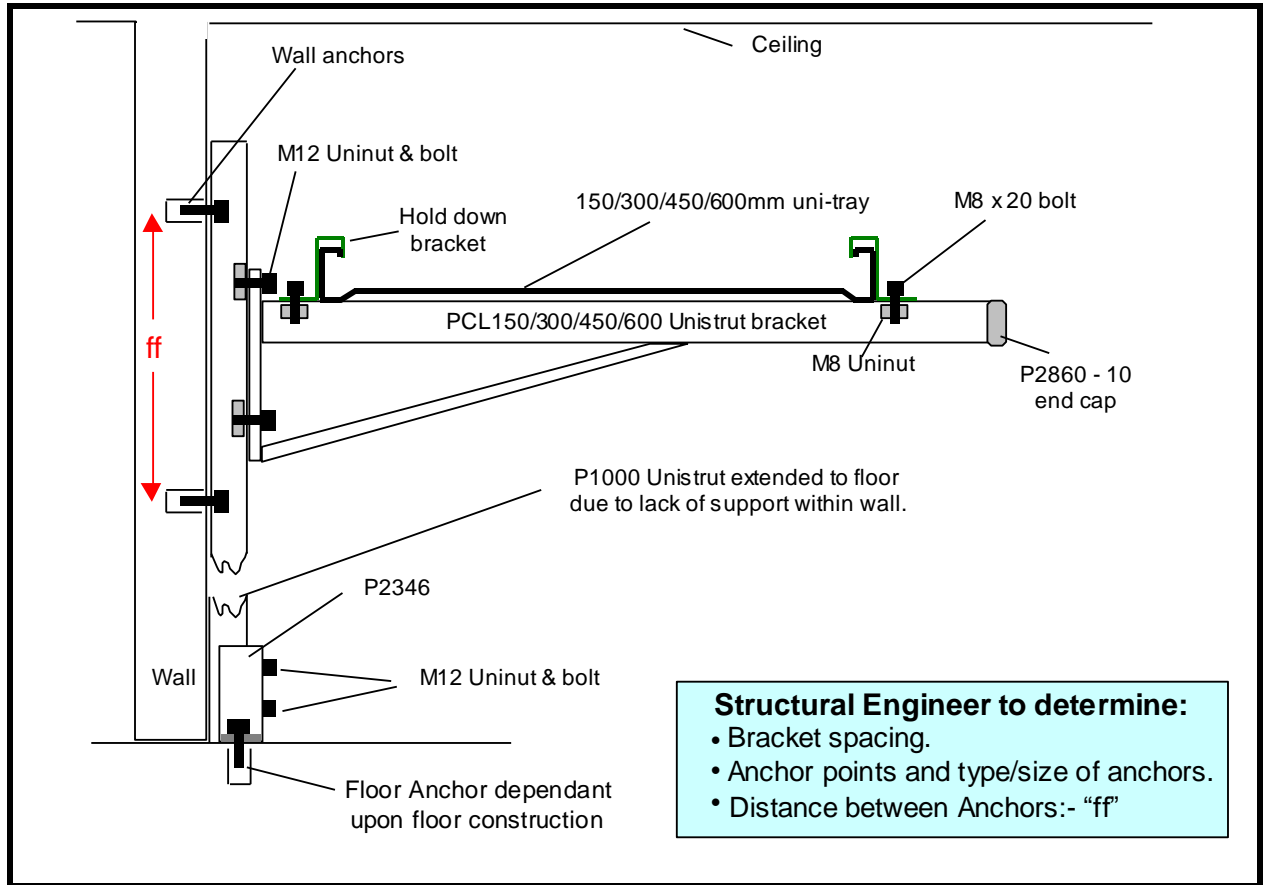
Cantilever Bracket on Solid Concrete Wall, Supported to Floor
